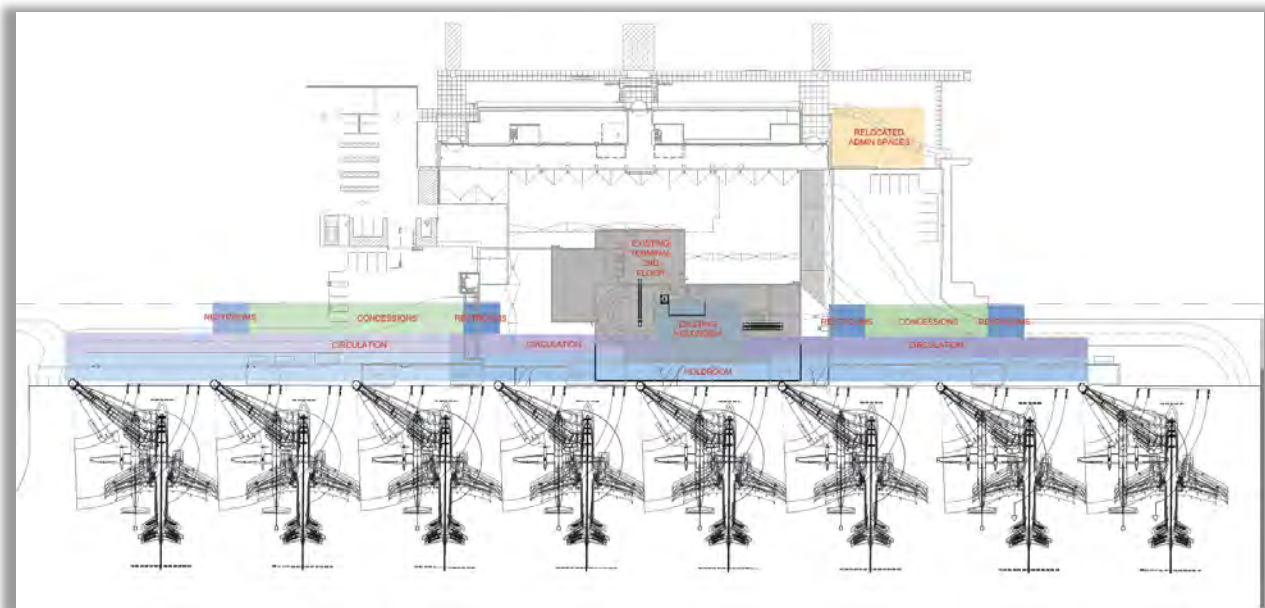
FIRST LEVEL TERMINAL BUILDING MASTER PLAN EXPANSION – PHASE ONE
